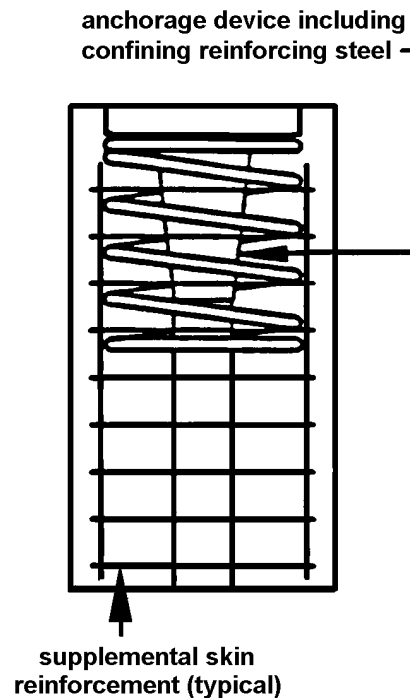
Special Anchorage Device Acceptance Test Specimen
